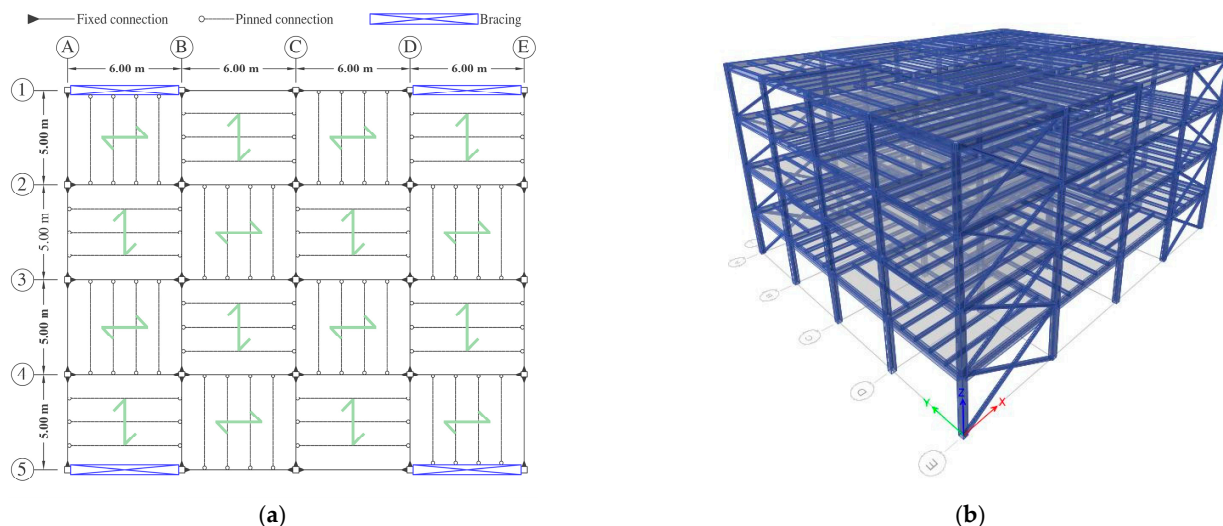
Geometrical details for the examined 4-story steel structure: (a) floor plan and (b) three-dimensional axonometric view (ETABS).
